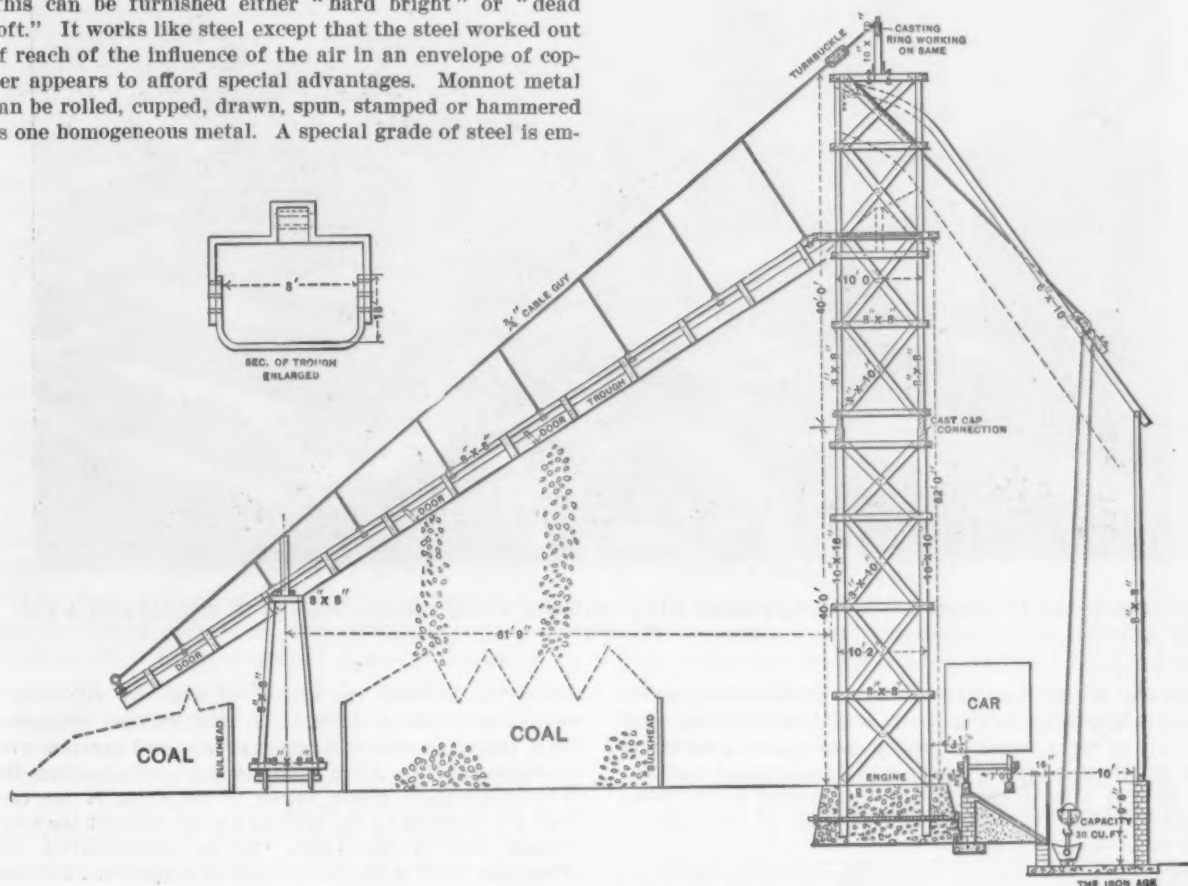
Section of Tower, Pit, Trough and Coal Pile.
